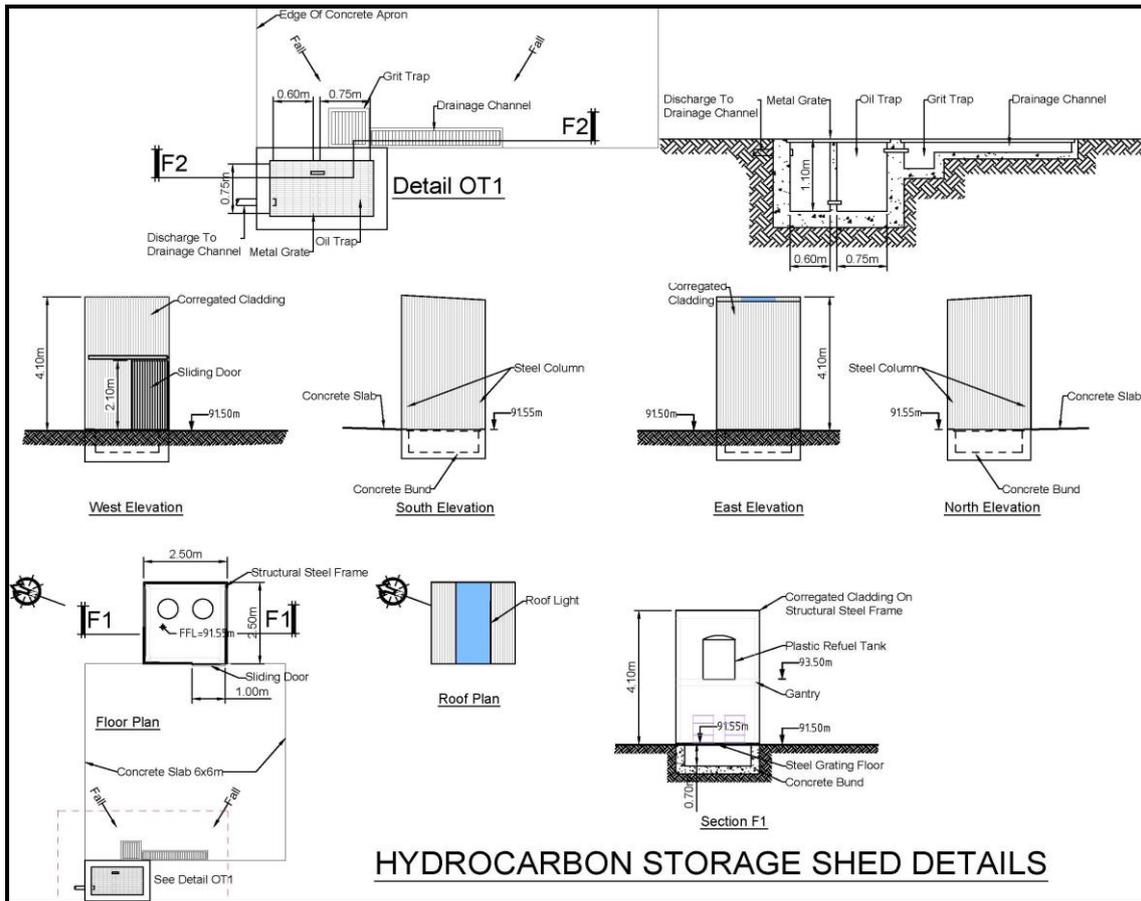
Proposed Fuel Storage Shed & Refuelling Pad
